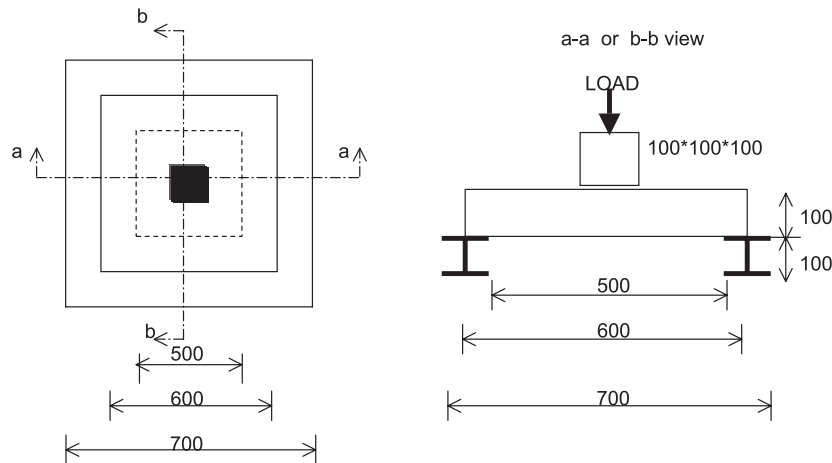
Set-up for EFNARC Panel Test (dimensions in mm).
